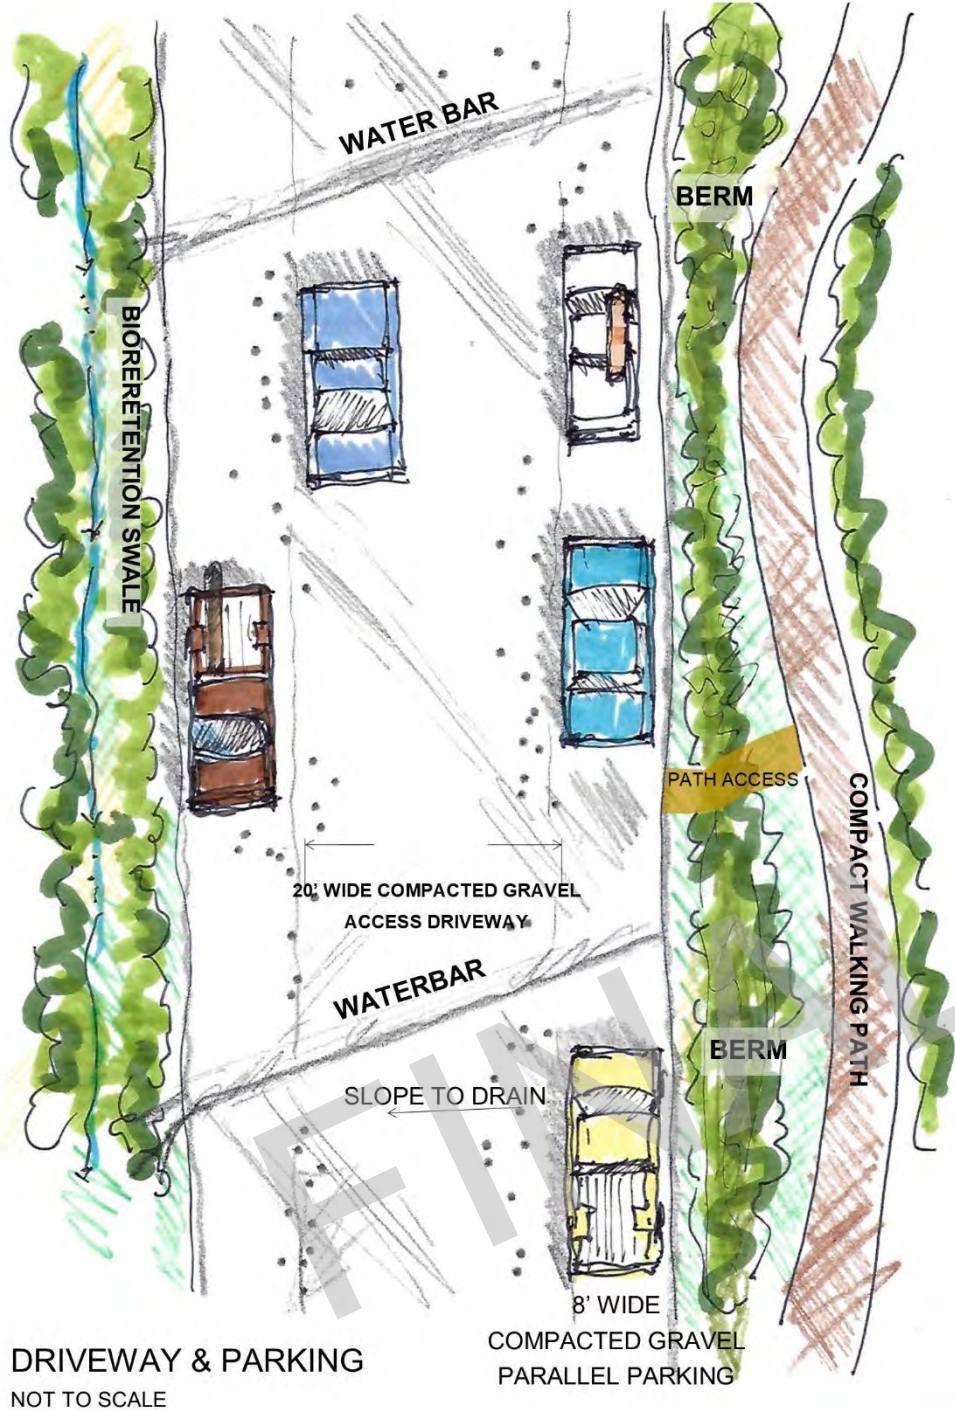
Lipoa Point Access Driveway and Parking Plan.
